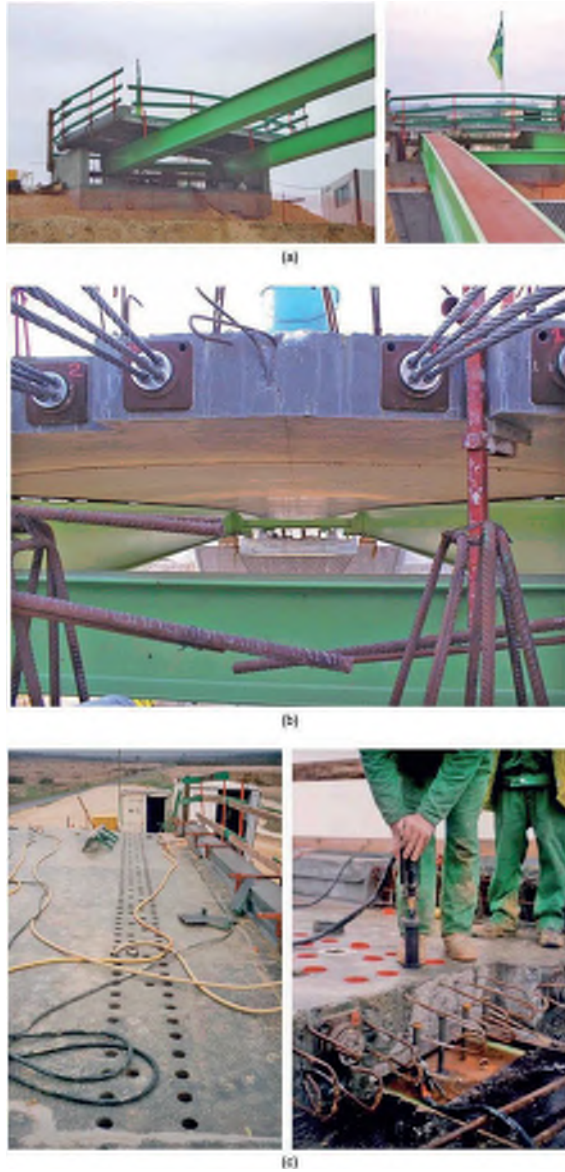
The VINCI assembling process (Reprinted with permission from Berthelley 2009): (a) elements are lifted and placed on girders without studs; (b) elements are prestressed; (c) studs are welded through holes in the deck
